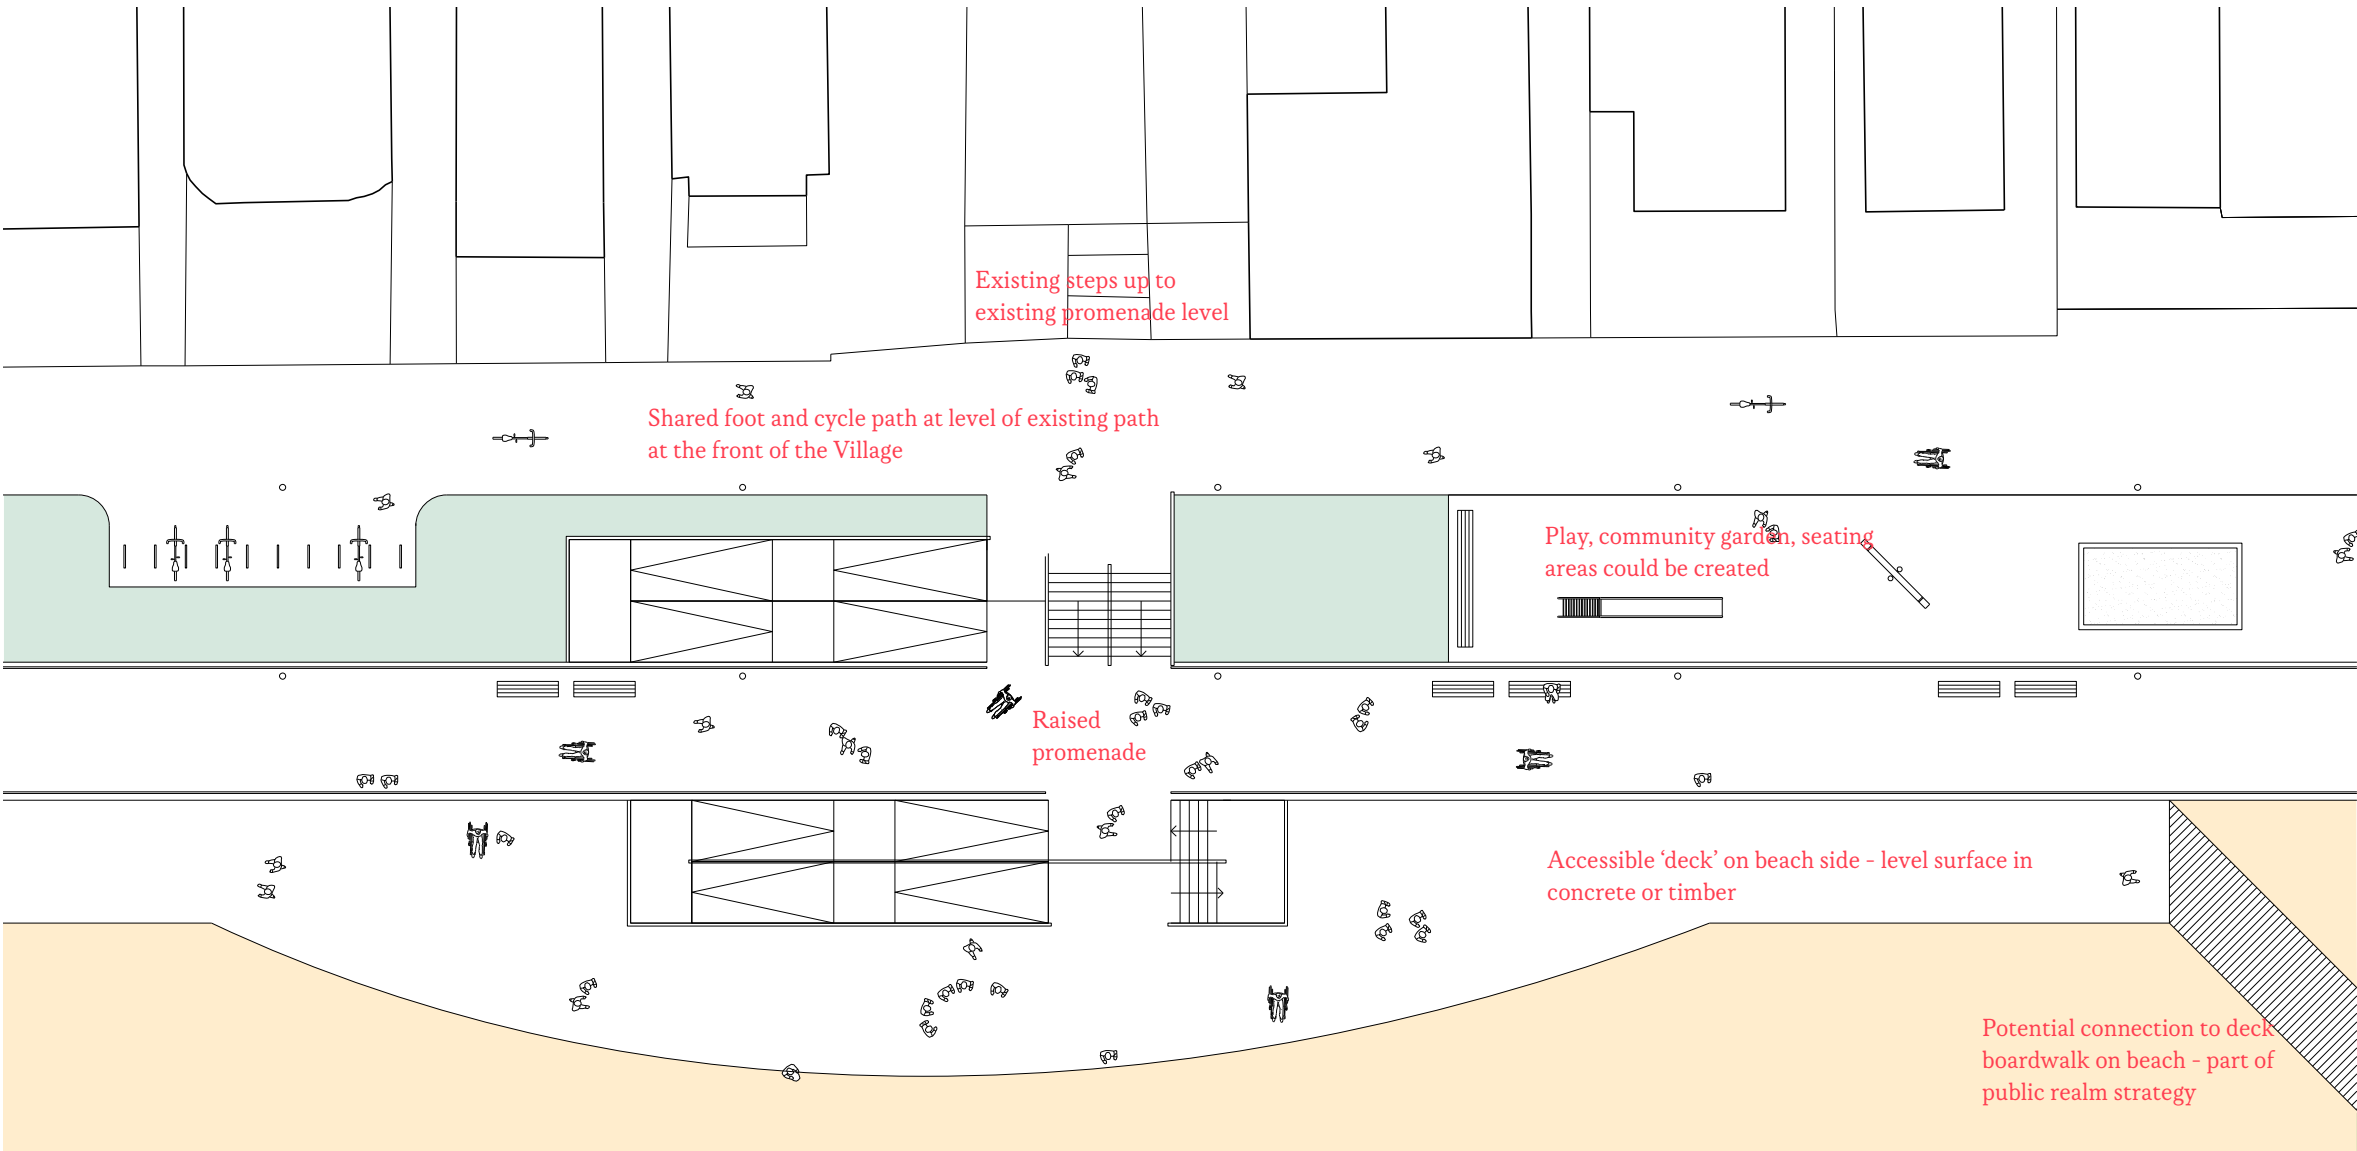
Option B - indicative plan of proposed new sea wall at the Village
